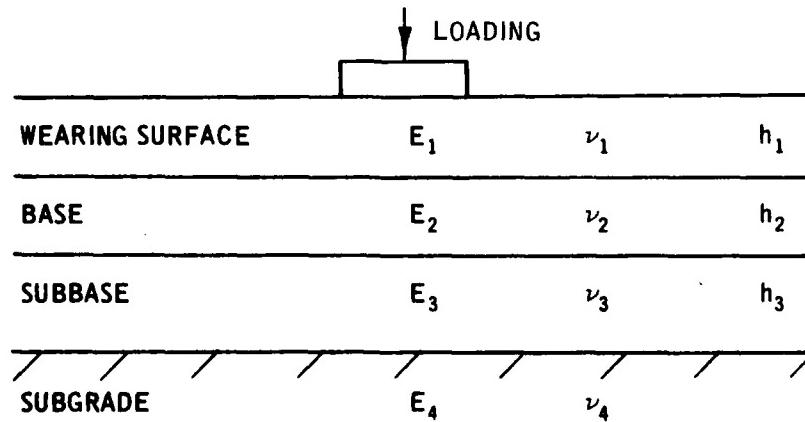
Typical pavement structure with loading according to the layered elastic theory
